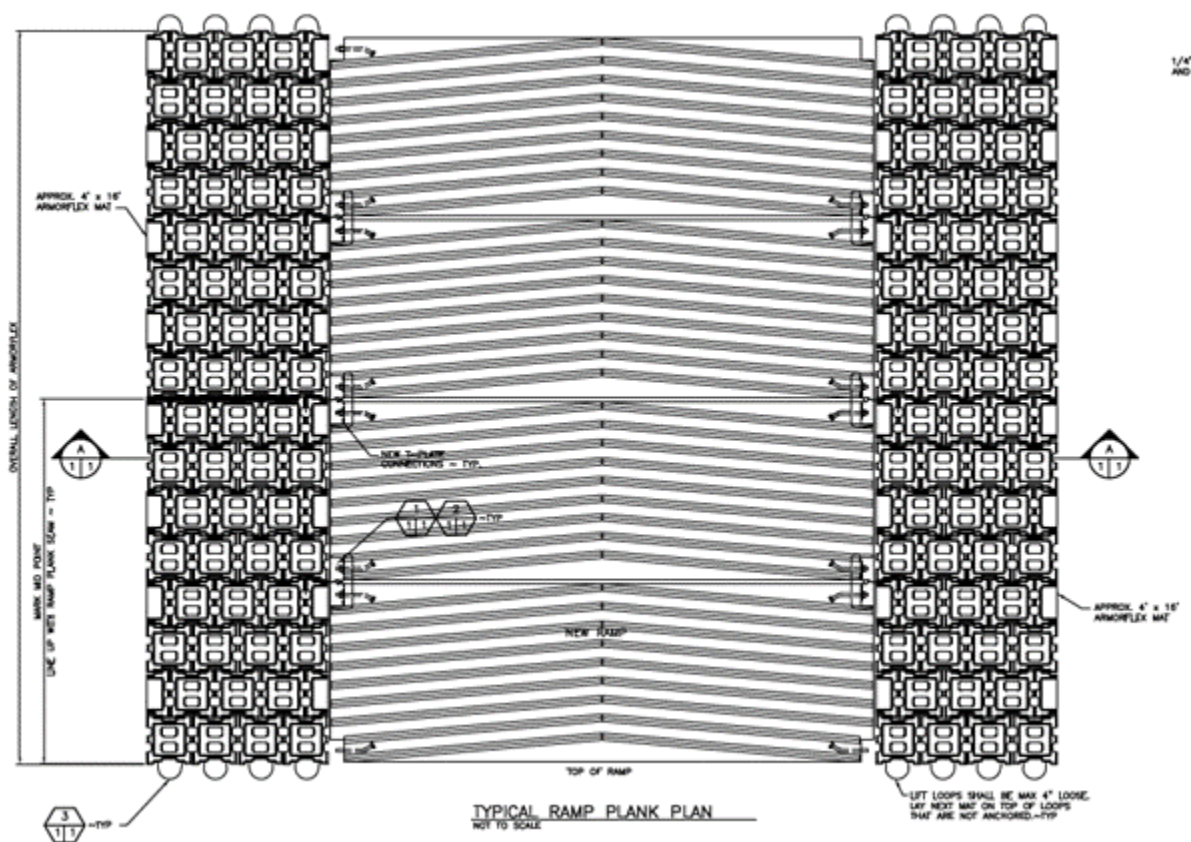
Plan view of the precast concrete planks bordered by sections of Armorflex.
